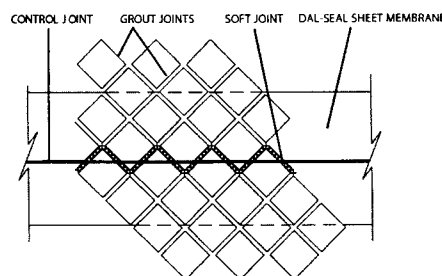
JOINT BRIDGING - PLAN VIEW (PATTERN)
